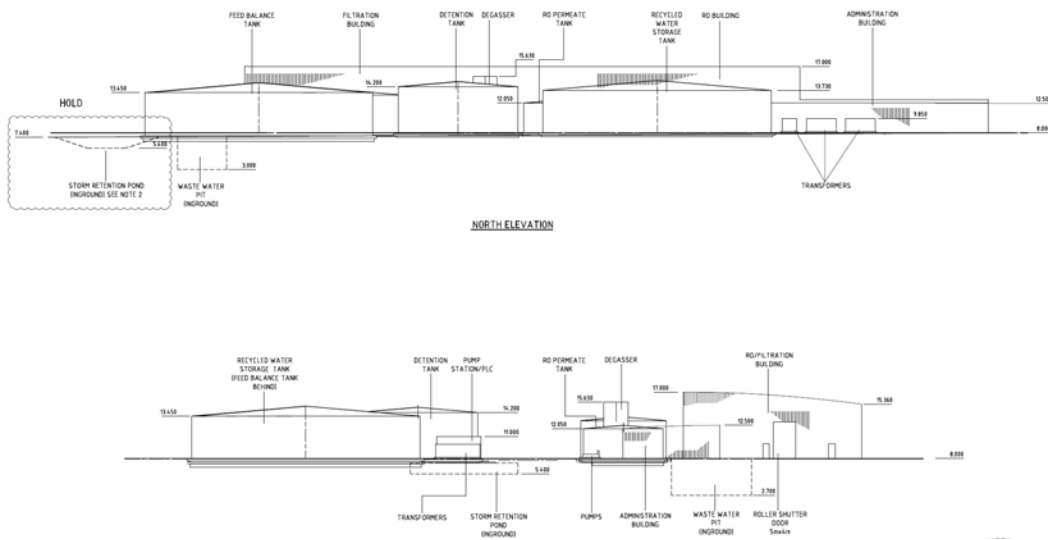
Revised and original elevations for Fairfield water recycling plant
